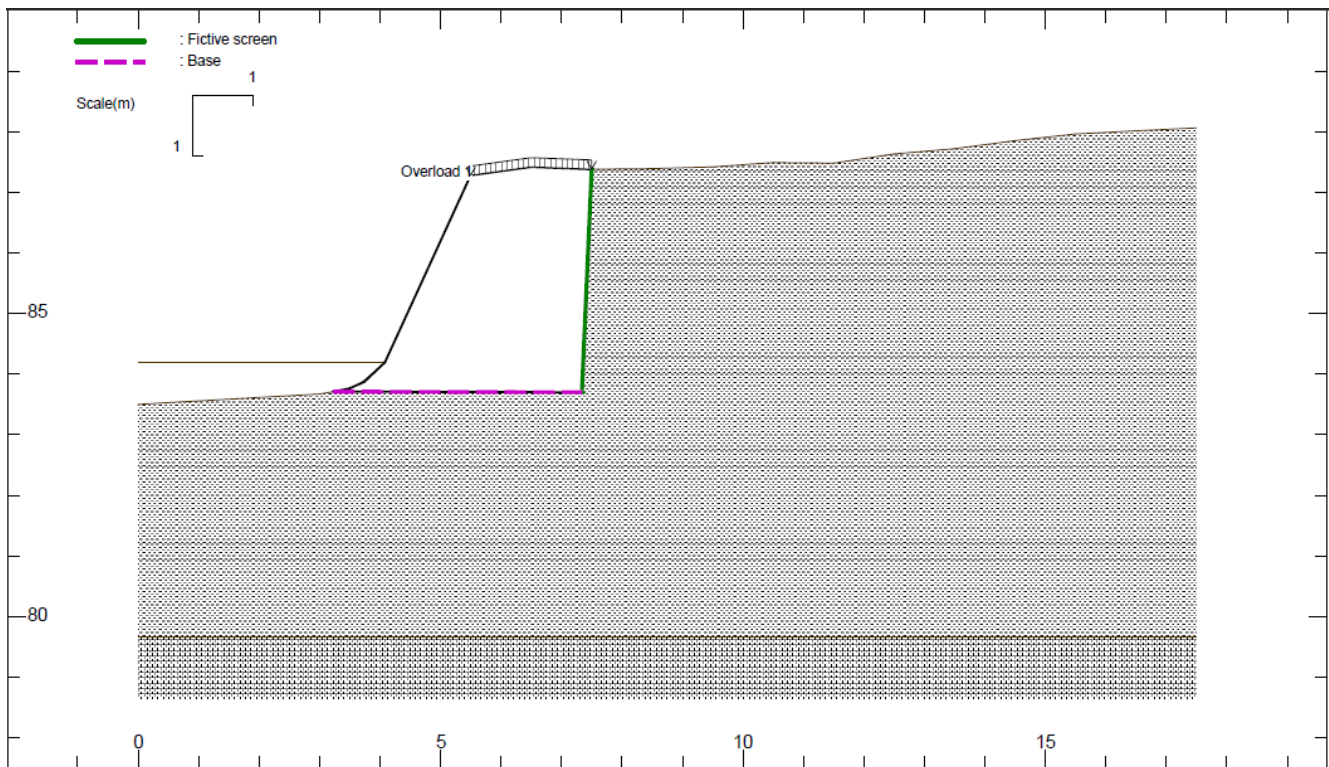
Reinforced soil mass profile assimilated to a weight wall, carried out with Geomur
